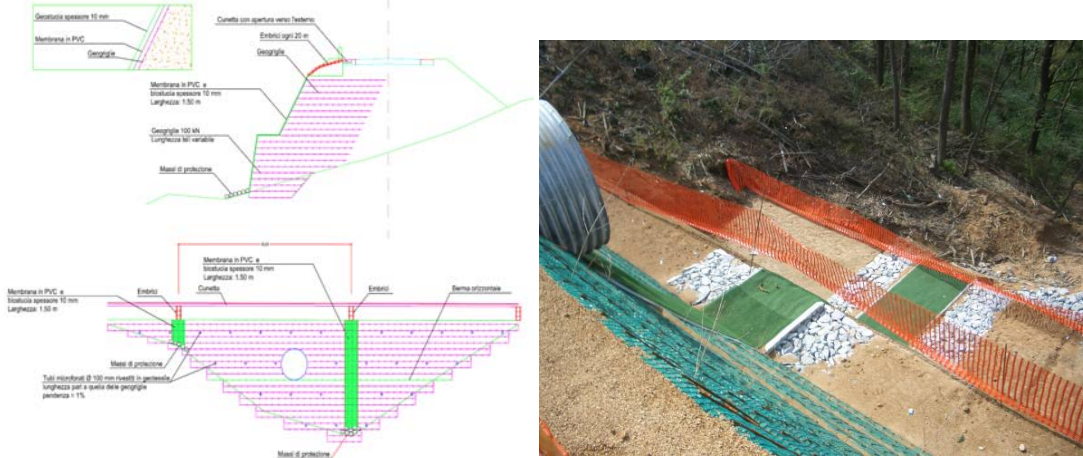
Scheme and details of the road platform drainage system and of the system for carrying water to embankment toe, through a PVC geomembrane and a geomat
